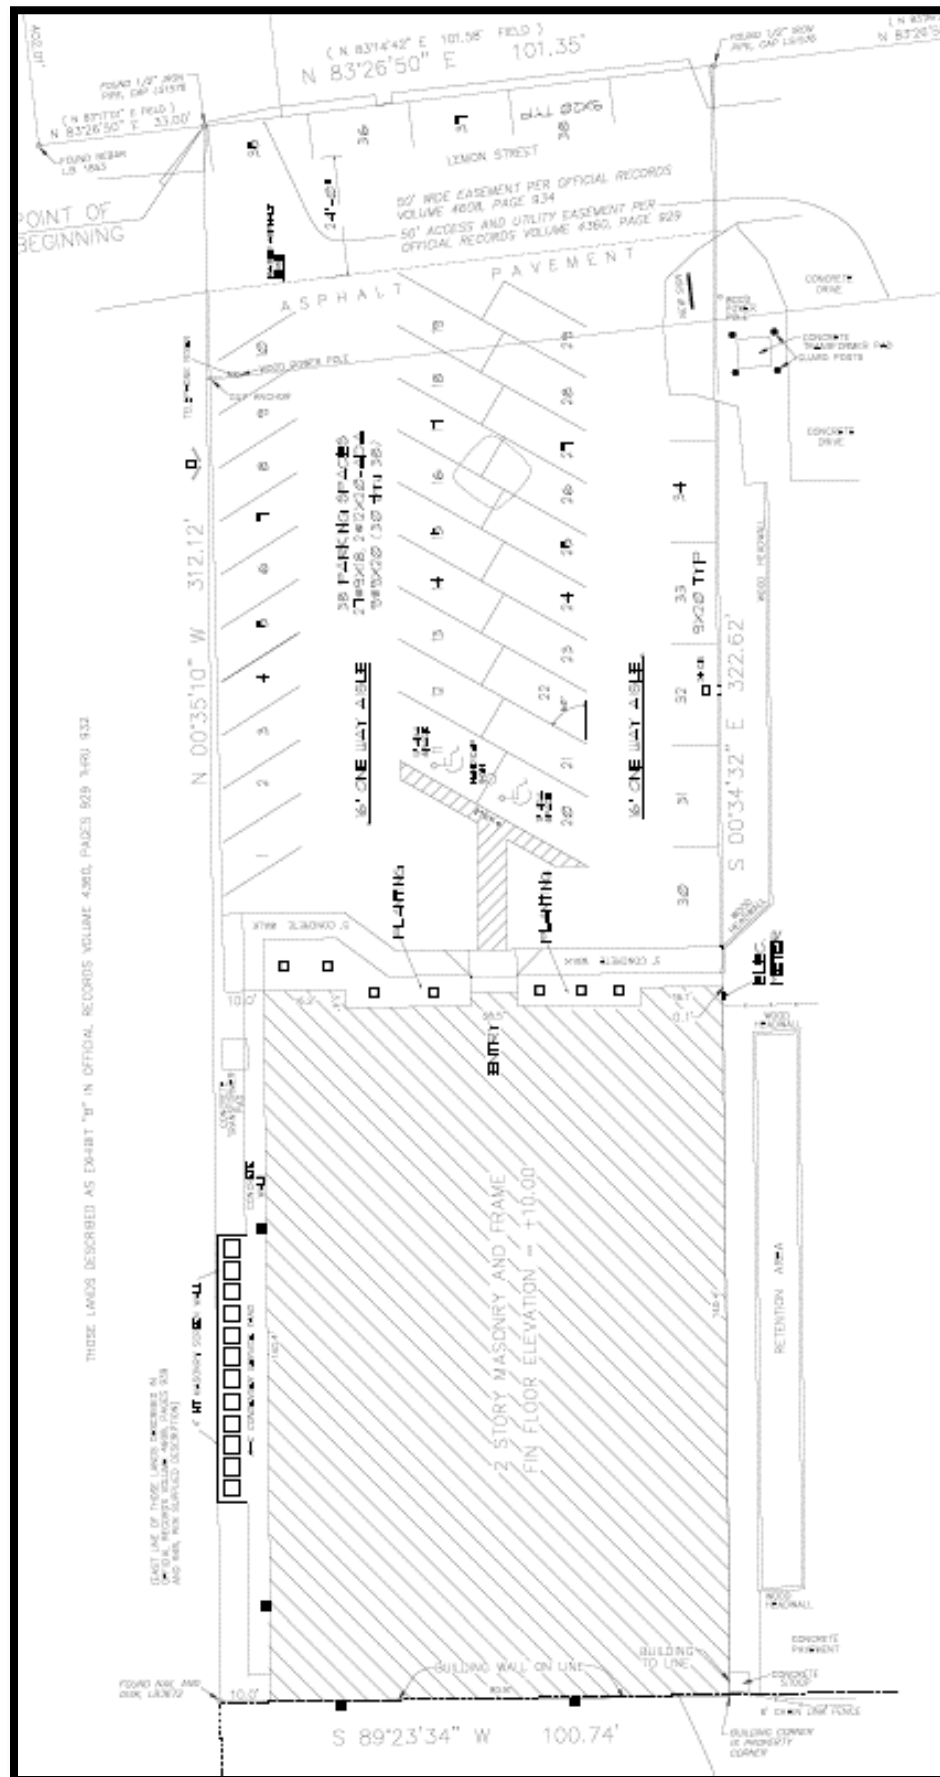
Proposed Site Plan 450 Atlantic Blvd, Neptune Beach, FL
